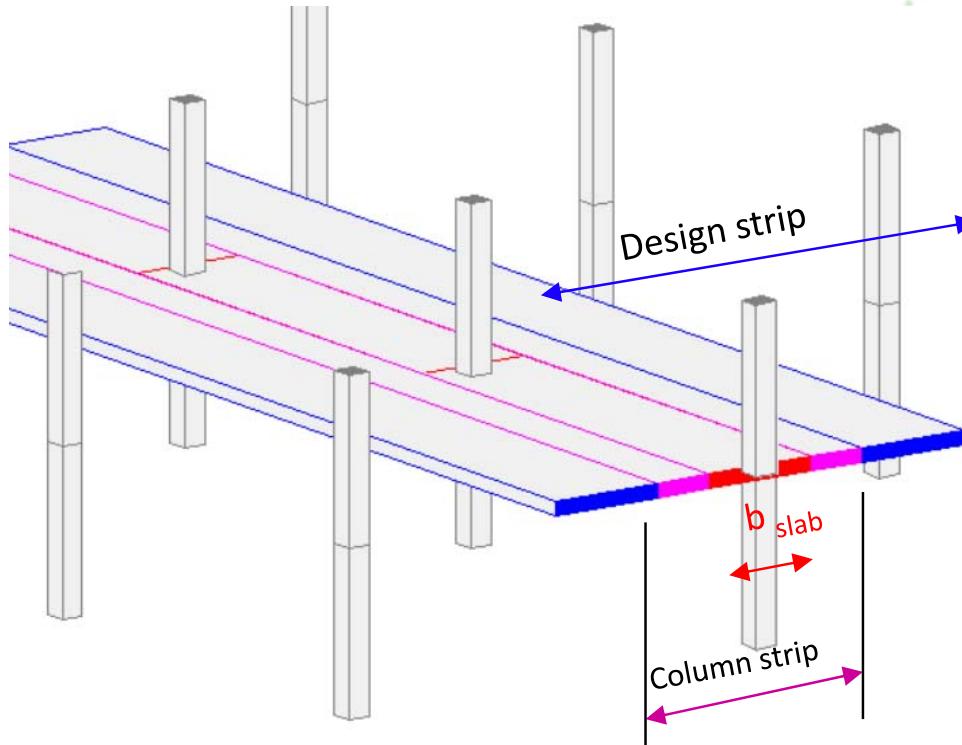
Additional reinforcement for PT edge connections.
